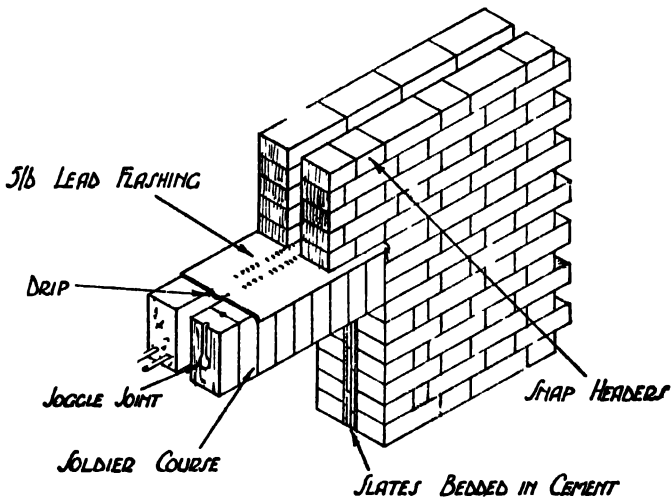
CAVITY WALL - BRICK HEAD TO OPENING
